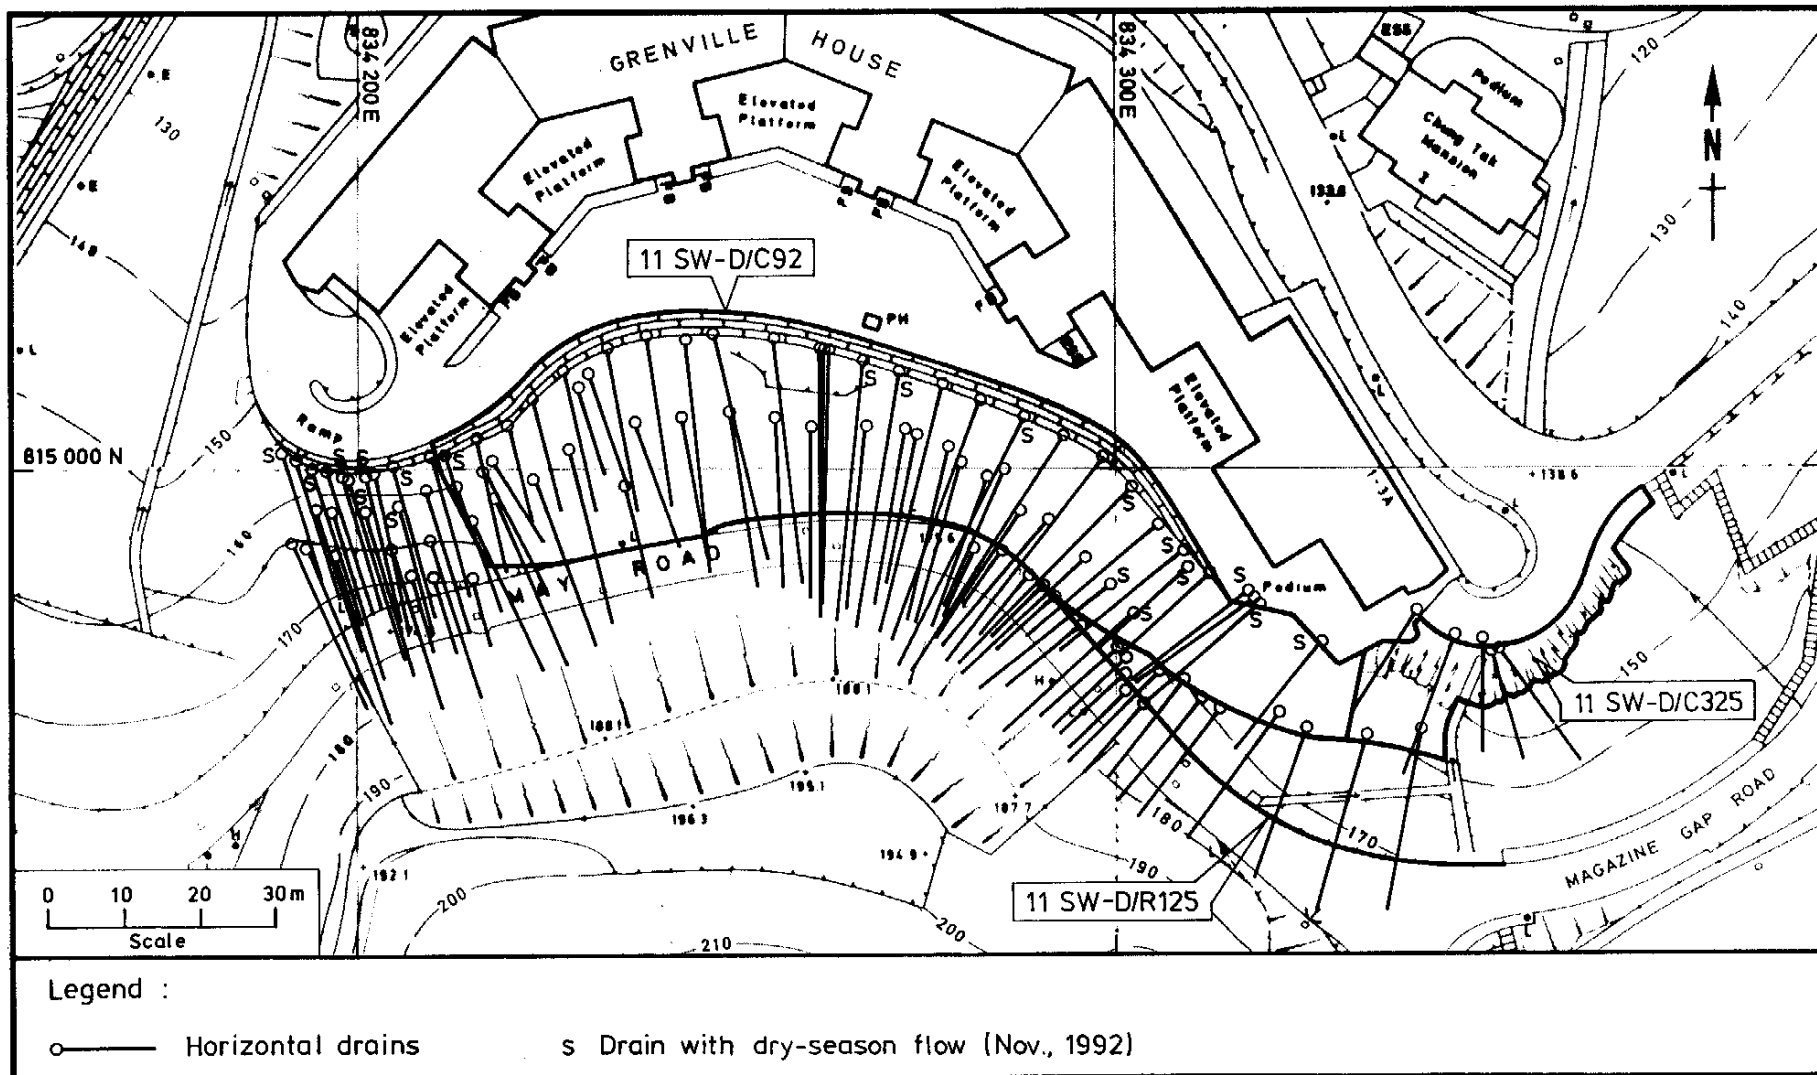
Layout of Horizontal Drains Behind Grenville House (after Tong & Maher, 1975)
